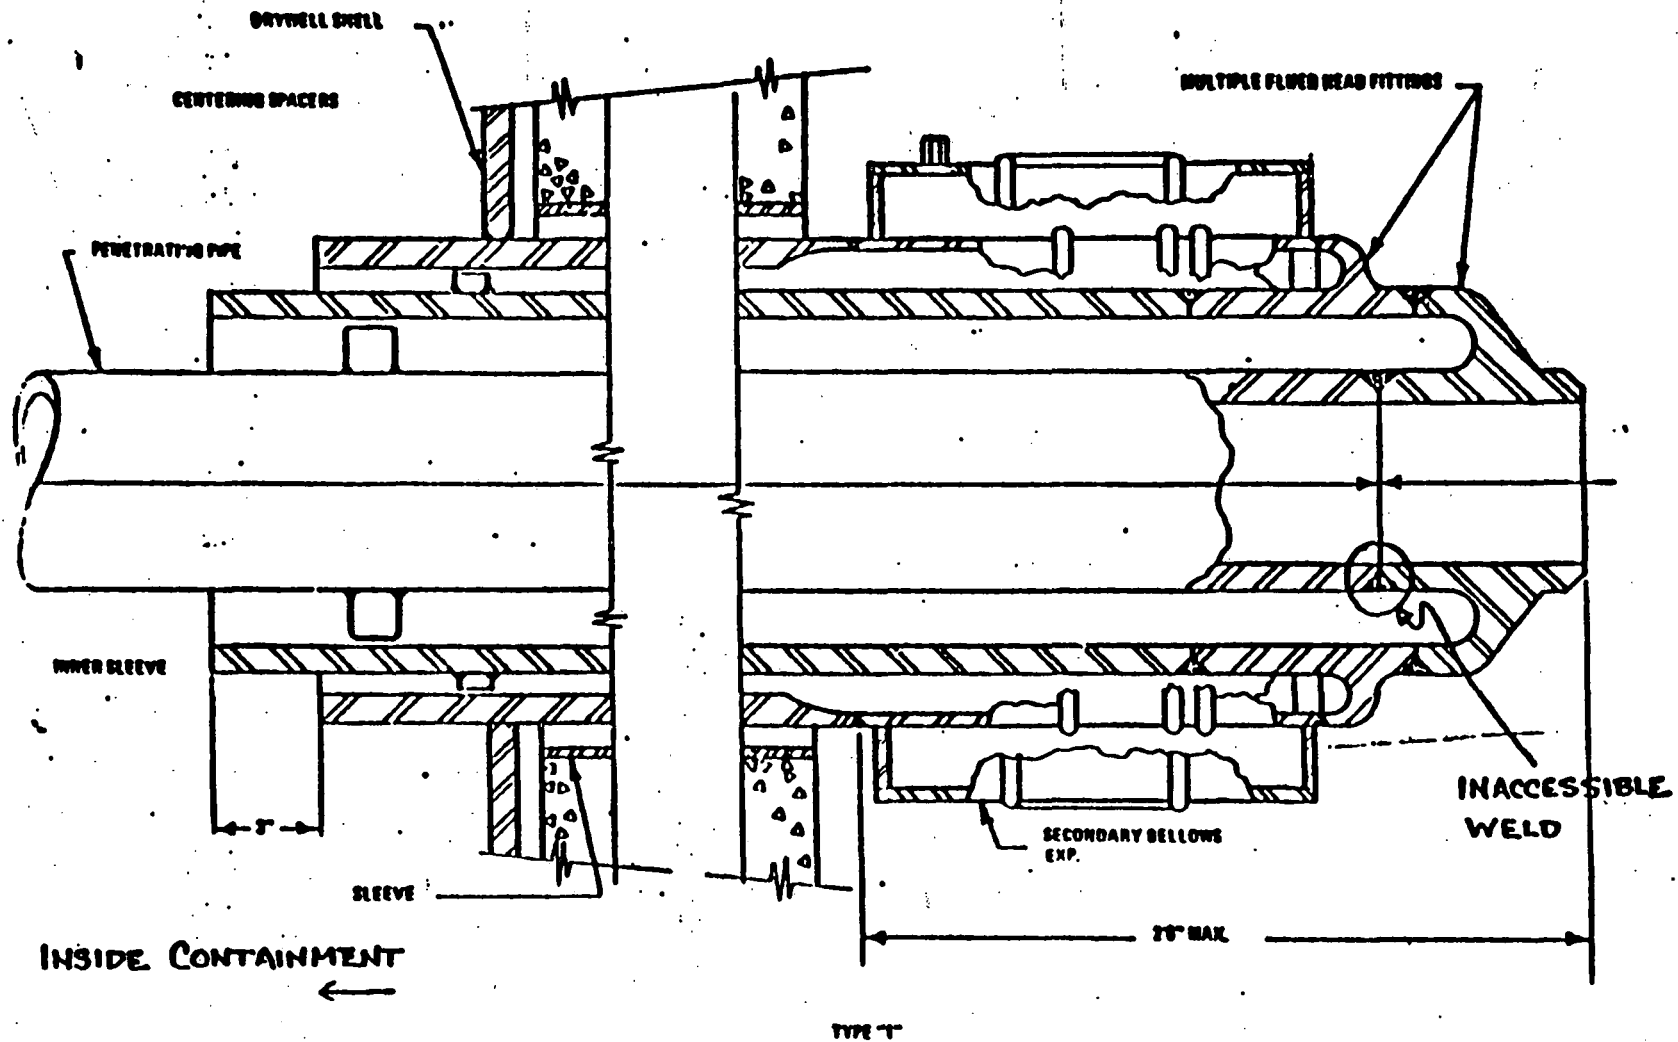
Center Section—Hot Fluid Piping Penetration Assembly
